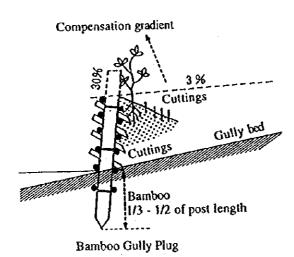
Front View of Bamboo Gully Plug (An Example)
